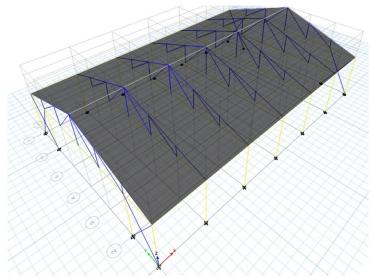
3-Dimensional model of Pre-Engineered Building having 24m span Pratt truss
